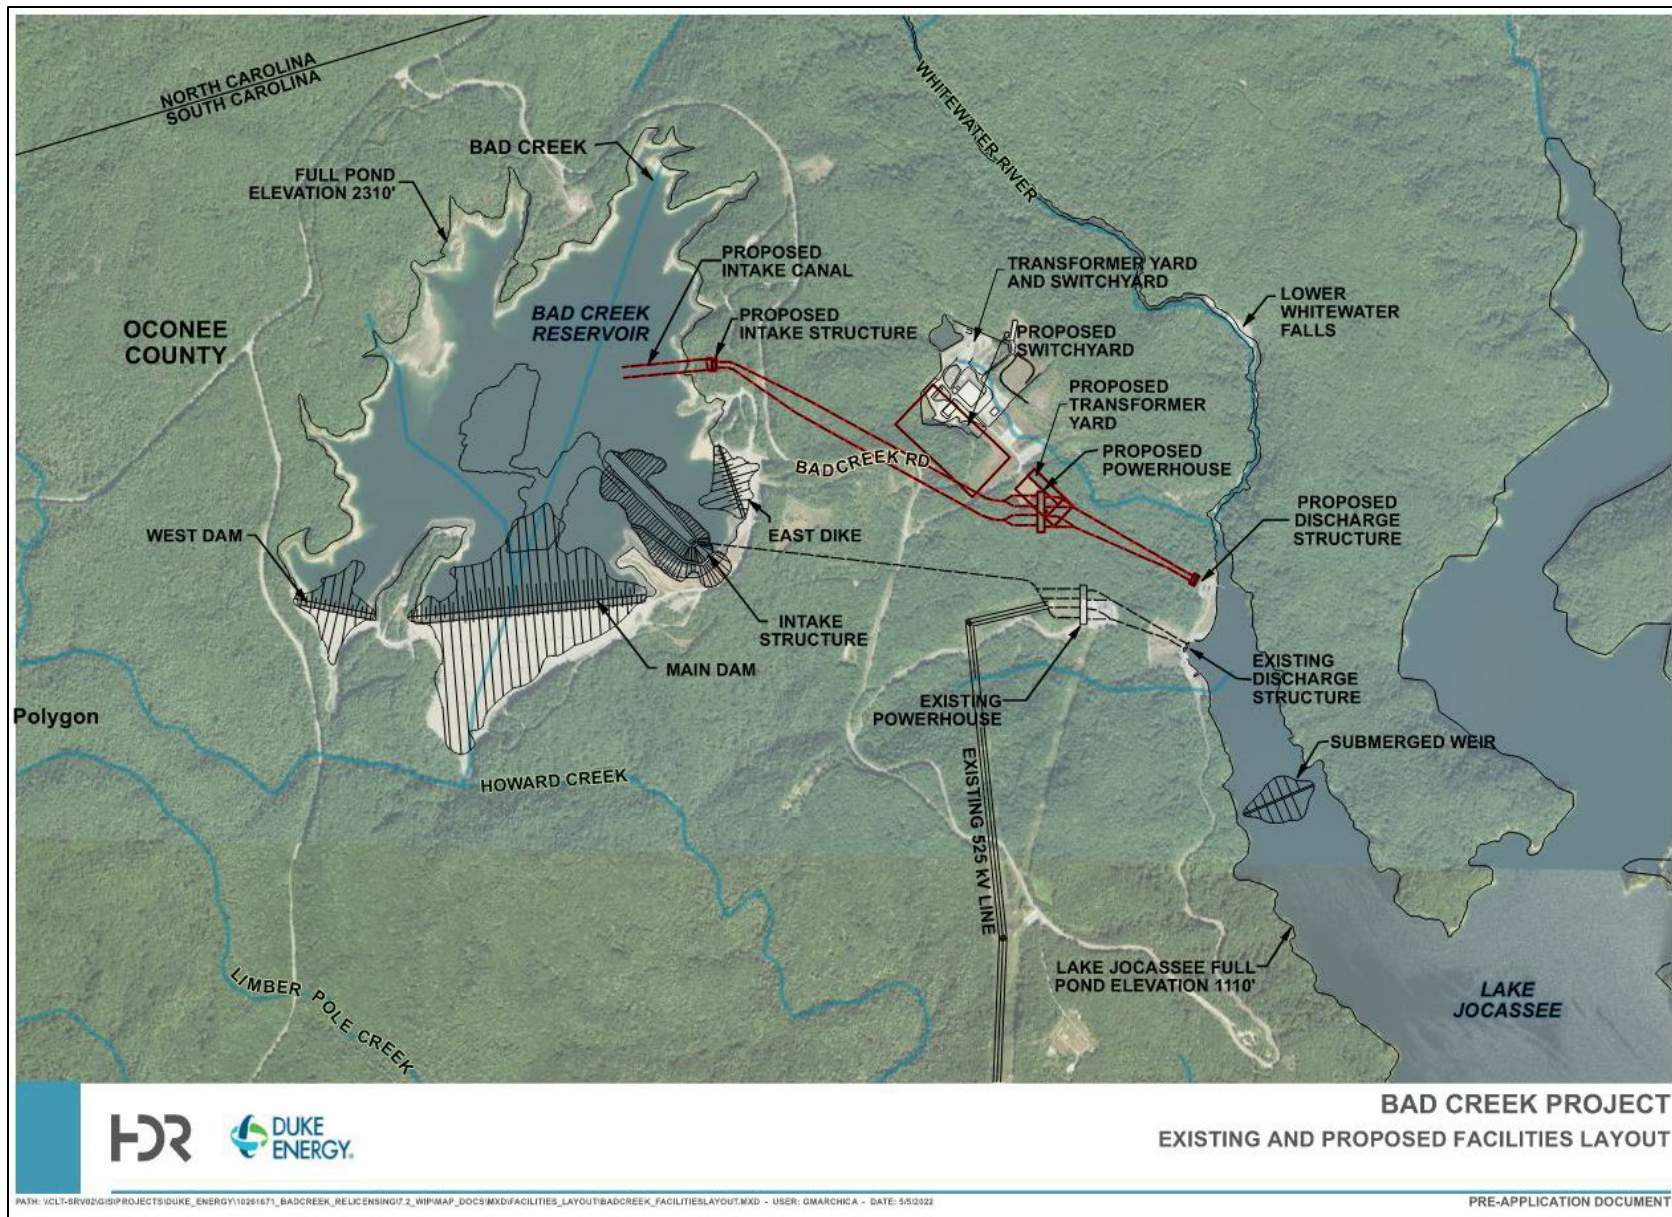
Proposed Bad Creek II Complex Facilities Layout (Major Existing Bad Creek Project Facilities are also Shown)
